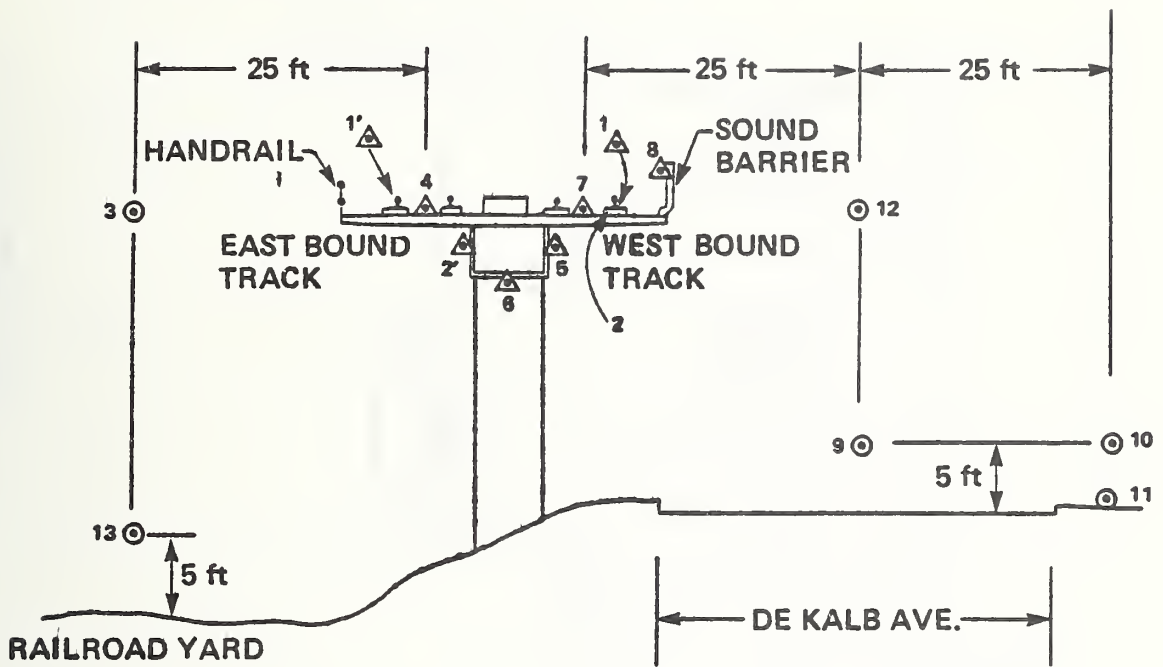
SKETCH OF MARTA CROSS-SECTION STRUCTURE, LOOKING WEST, SHOWING TRANSDUCER LOCATIONS.
